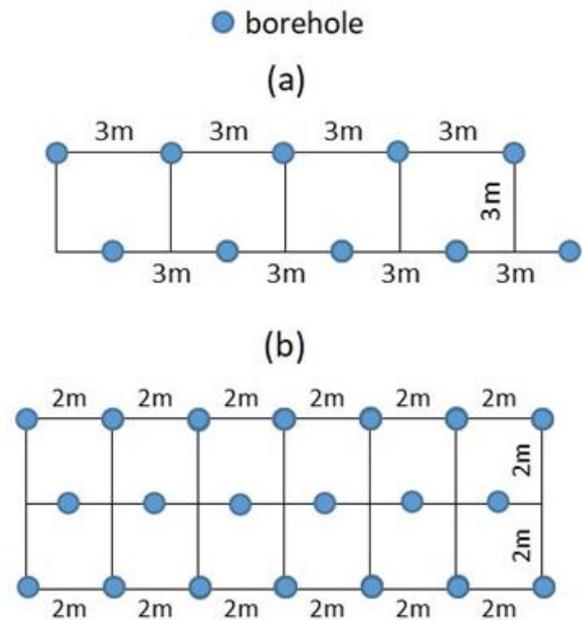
Details of (a) curtain grouts, (b) blanket grouts.
